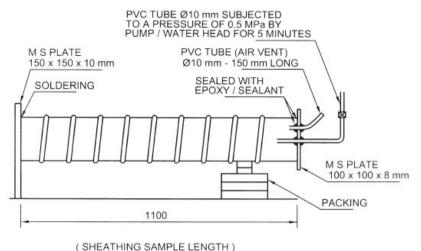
Test For Water Loss Study C1.7.2 Corrugated HDPE sheathing ducts
